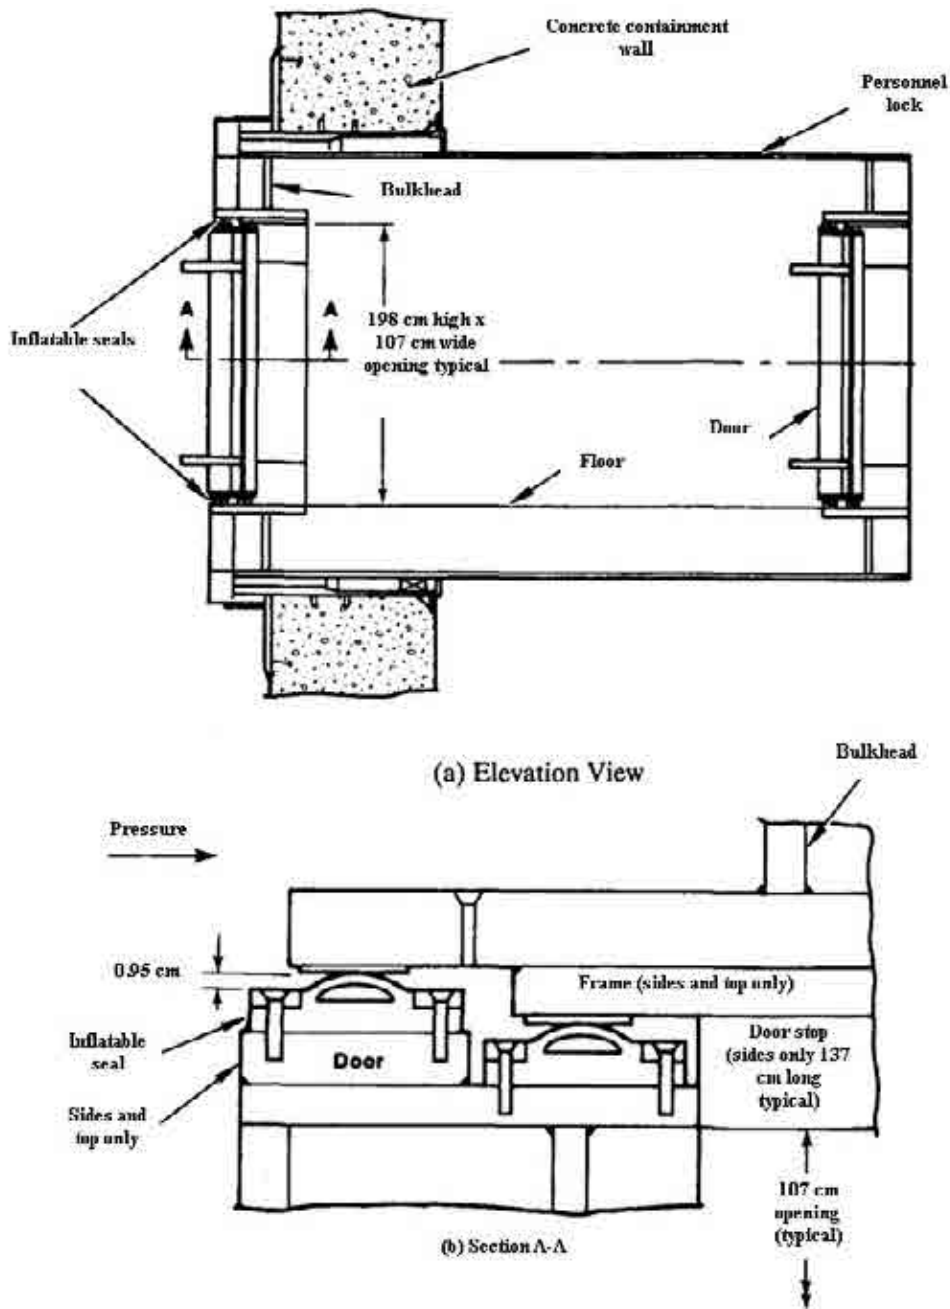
Example of a personnel airlock and inflatable seal for a PWR: (a) is elevation (cross-section) view; (b) shows detail of door sealing arrangement from (a) (adapted from Ref. [13]).
